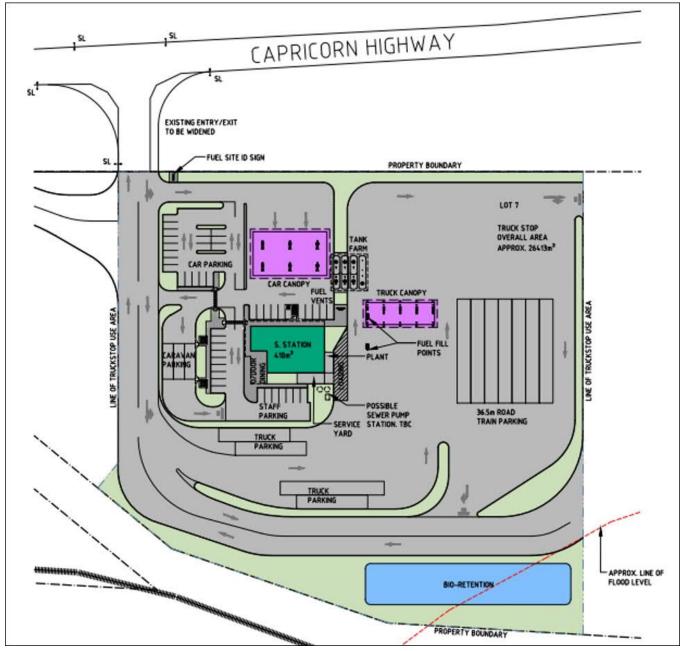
Extract from Site Layout Plan (Dwg. 18294-D04 Rev A)
